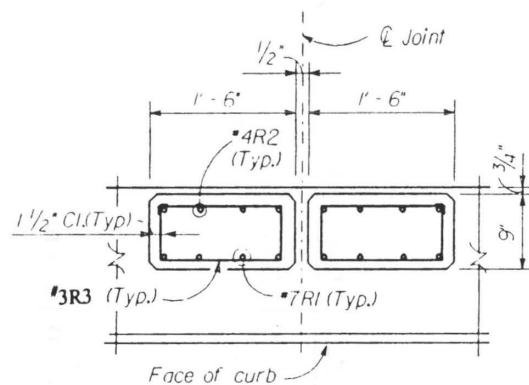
Design details of the Foothills Parkway Bridge Rail for Test FPAR-3.
